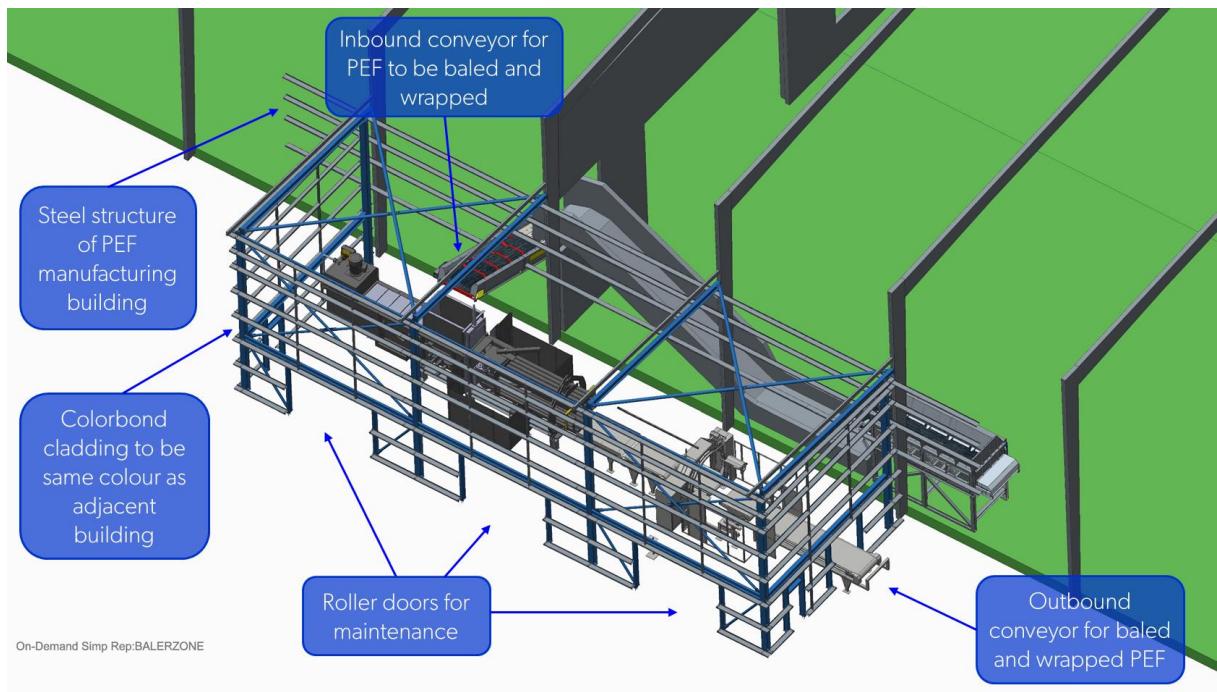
| Detail of Enclosure Structure around Baler and Wrapper
